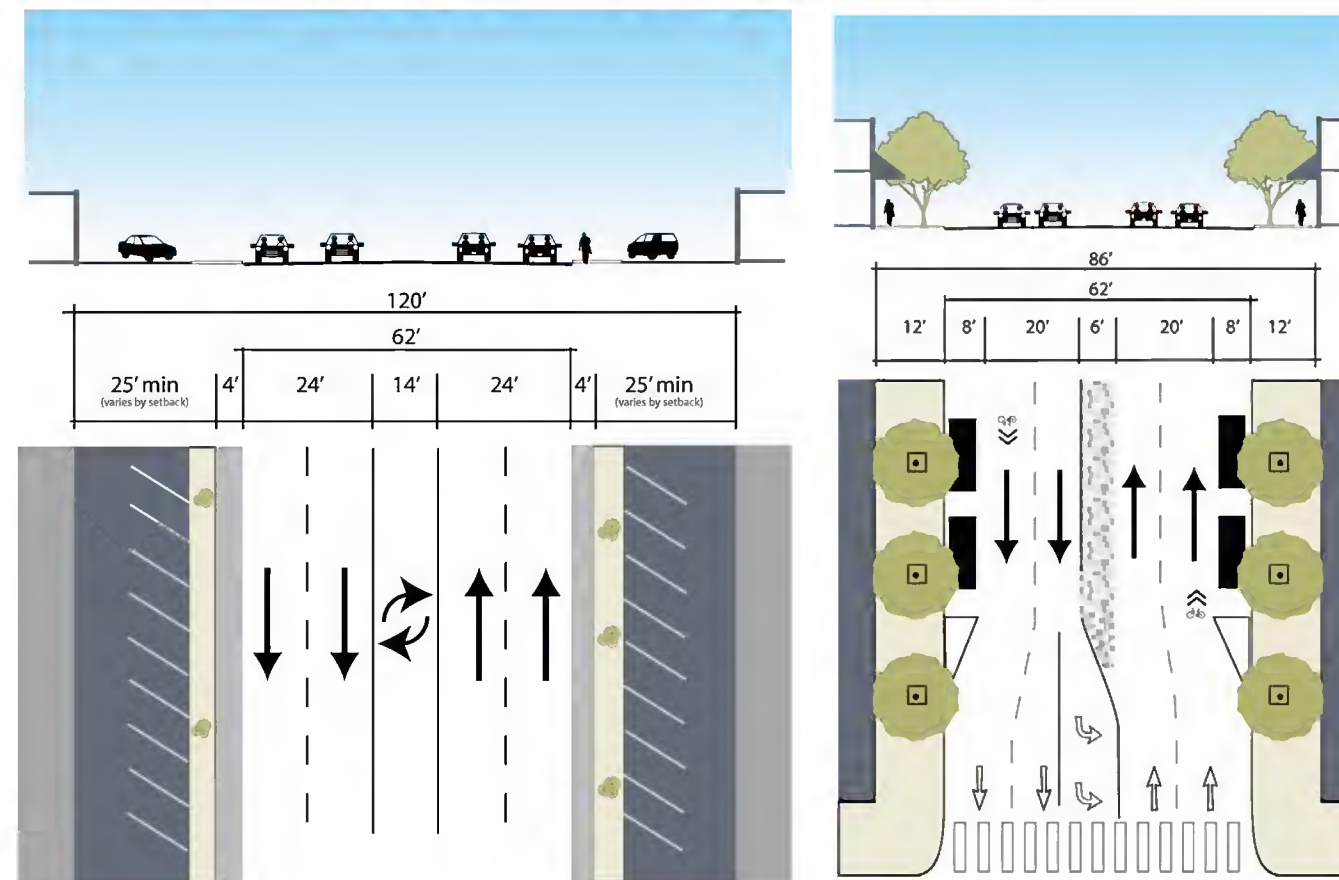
Existing cross-section of Broad River Road in C5 thoroughfare section (left), Proposed cross-section of Broad River Road in C5 thoroughfare section(right).
